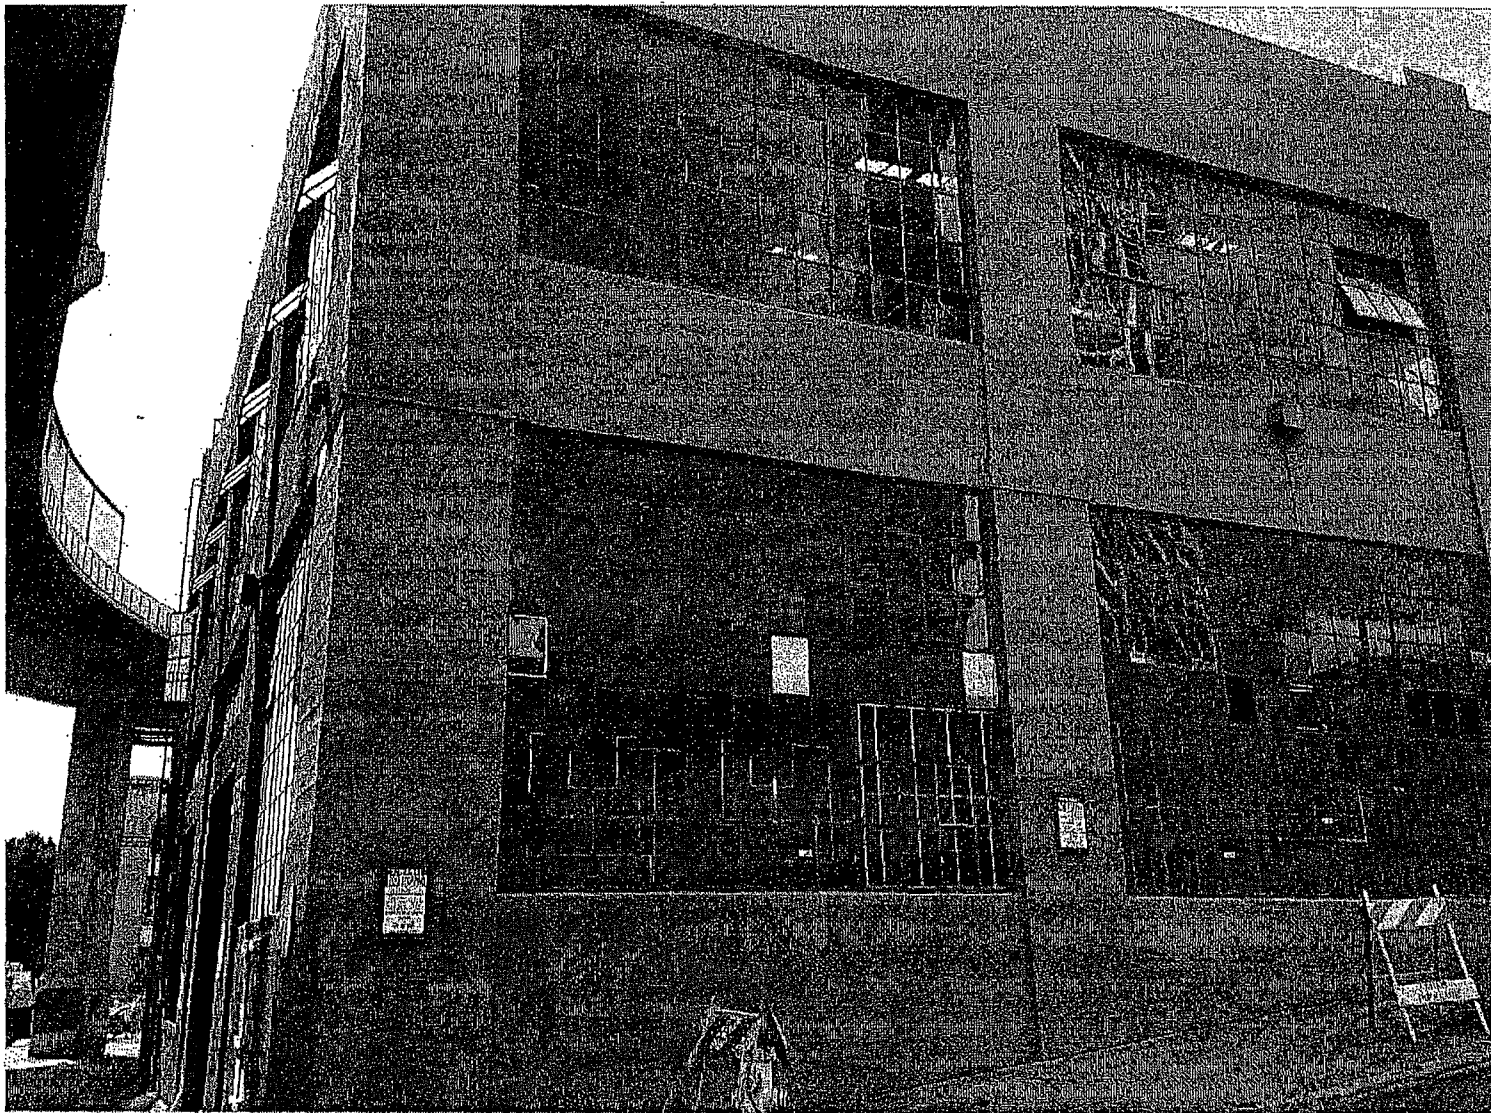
Project site viewed from Rincon Street, just north of Bryant Street, looking west. Westbound I-80 Harrison Street off-ramp viaduct is visible in the upper left. – March 28, 2014
